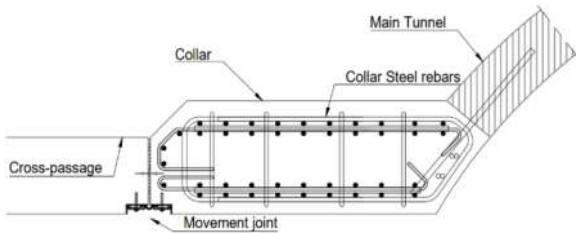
Example of a connection collar steel reinforcement with the movement joint at the intersection between the main tunnel and the cross passage.
